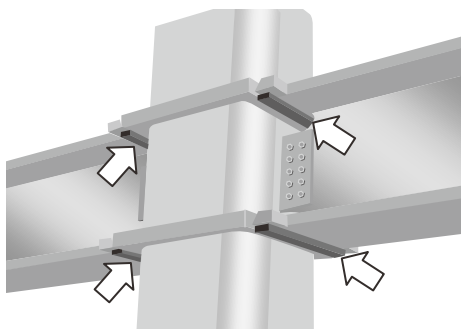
Position of the backing plate for the groove welding in the column-to-beam connection of the on-site bracket-less joint style.
